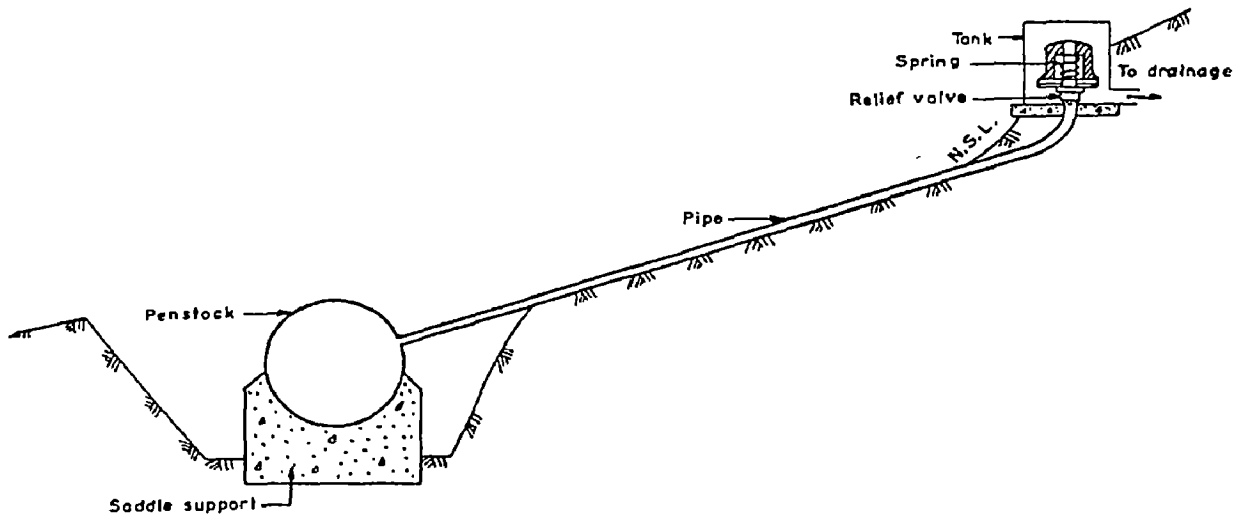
LAYOUT OF WATER WASTING RELIEF VALVES
